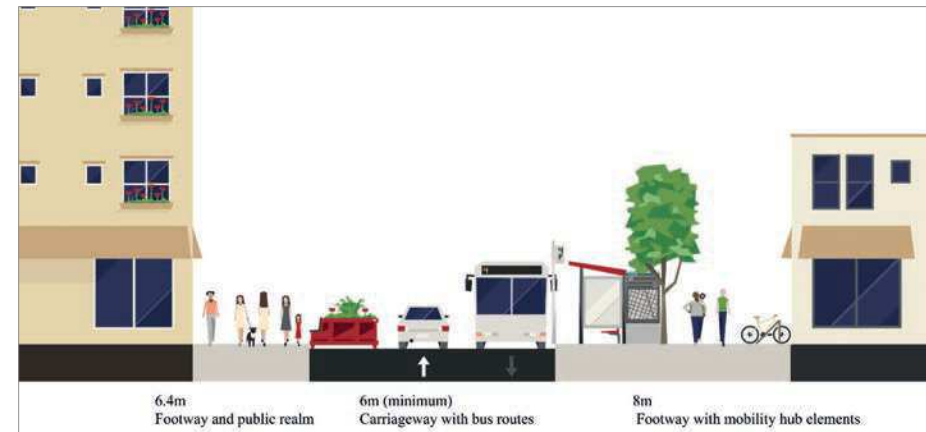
Buccleuch Street Indicative Proposals © Street Mix
